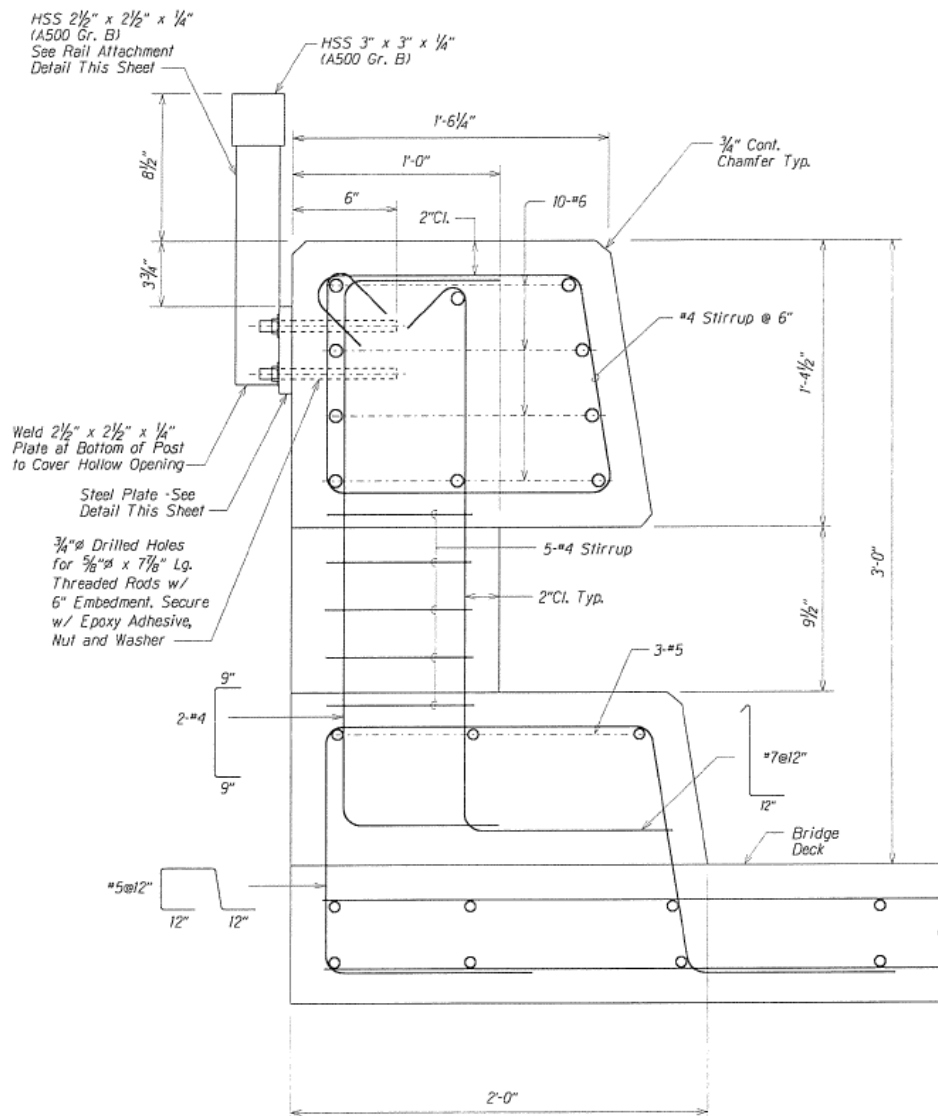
Hawaii Modified Natchez Trace Bridge Rail Design Details
